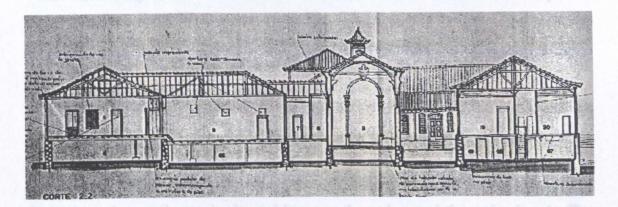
section in the Seminary Building (the roof structure shows different traditional timber solutions in each block) ²²⁴
